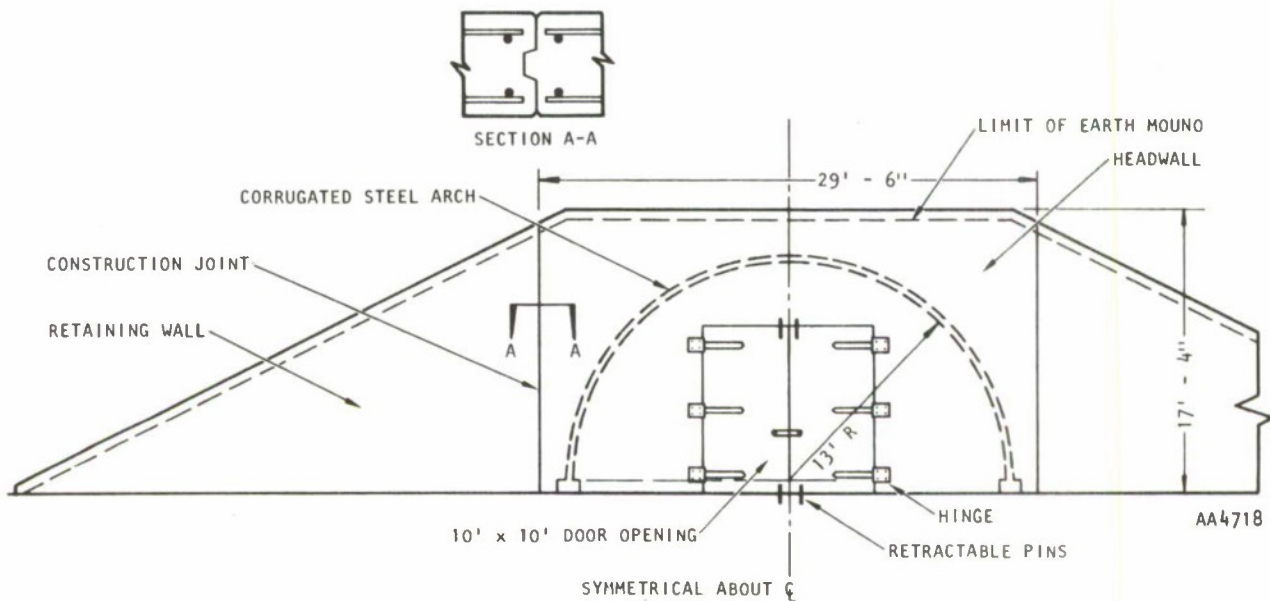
HEADWALL, DOOR AND RETAINING WALLS
